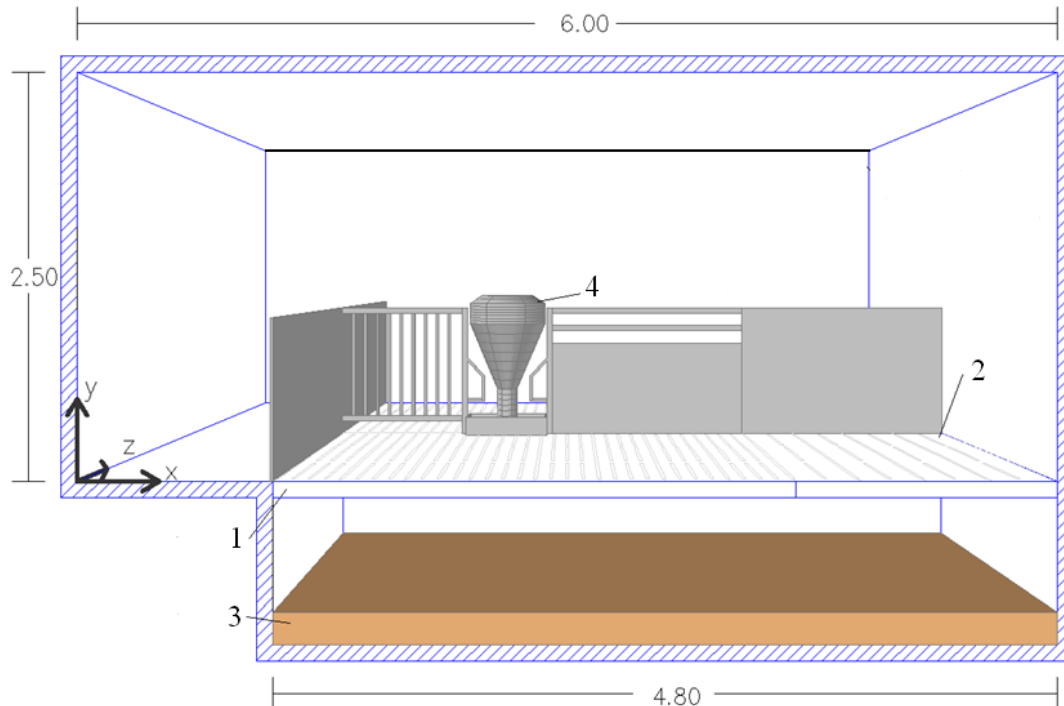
Sketch of the model pig pen. 1=slatted floor; 2=drained floor; 3=slurry; 4=feeding operation (revised from Bjerg et al. (2008)).
